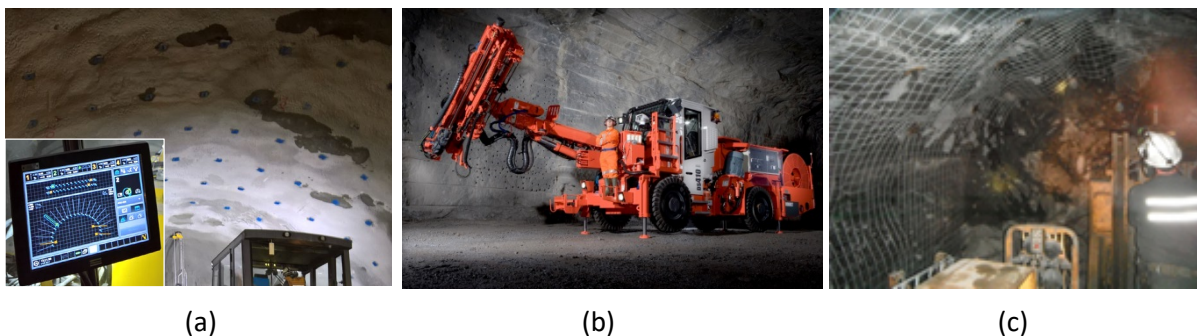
Categories of equipment for the installation of mesh/screen support: (a) Face drill rig; (b) Dedicated mechanised bolter; (c) Dedicated semi-mechanised bolter
